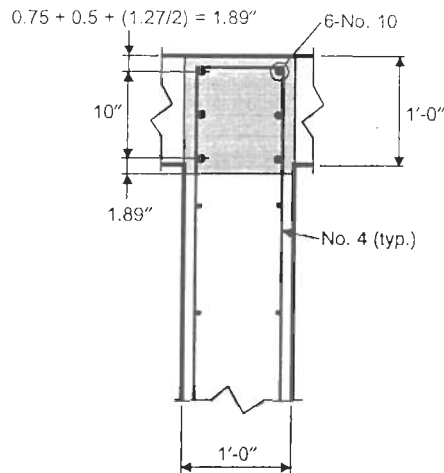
Longitudinal Reinforcement Ratio at Wall Boundary
